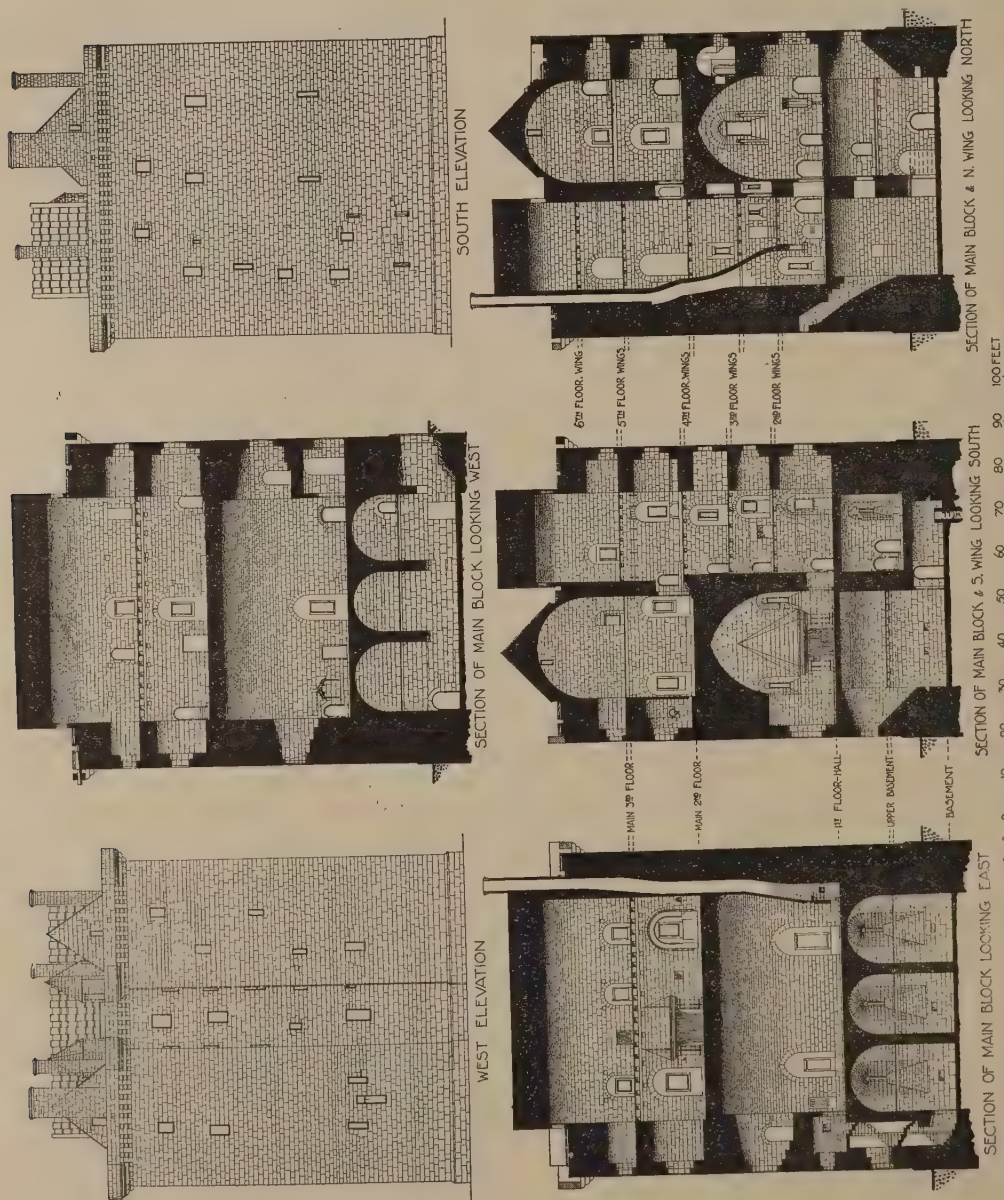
Borthwick Castle (No. 3) : Elevations and Sections.
